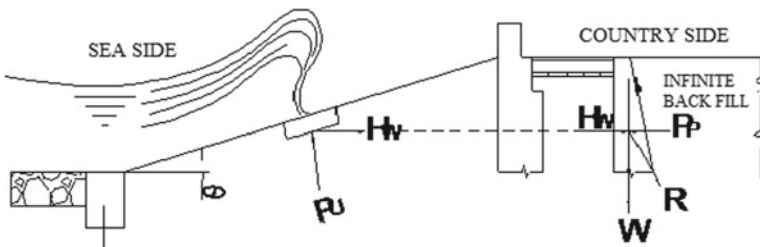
Schematic diagram of forces acting on masonry retaining wall
